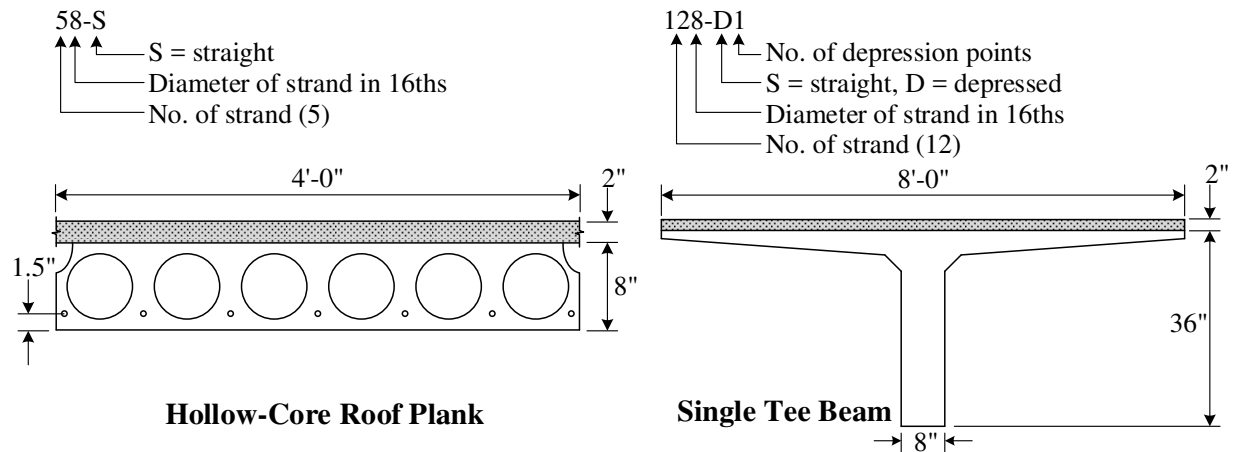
Cross-sections Used in the Roof System of the Main Building and the Girls' Gym.
